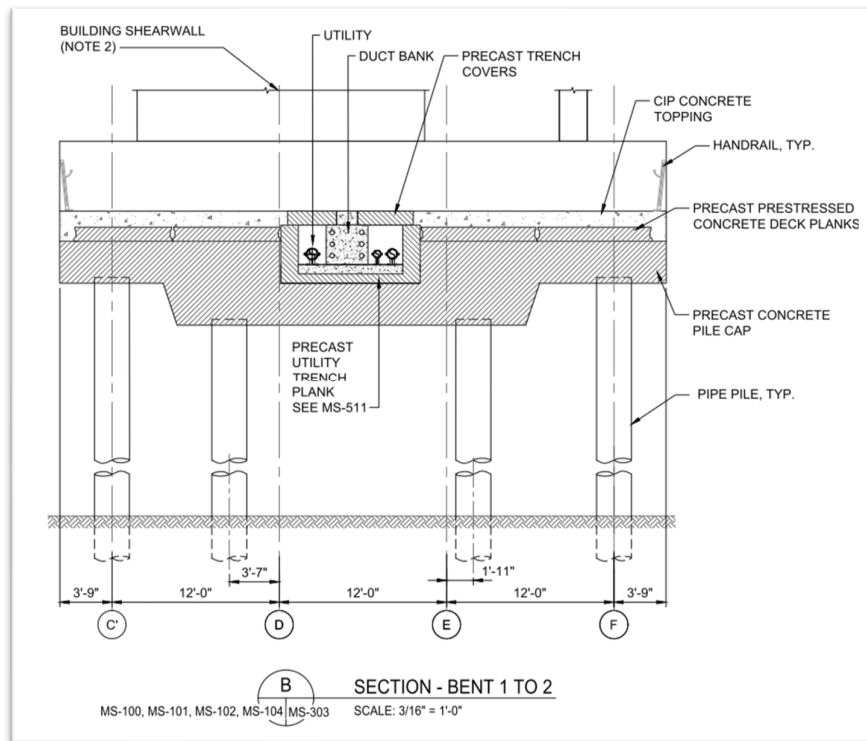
shows the configuration of the duct bank underneath the slab
